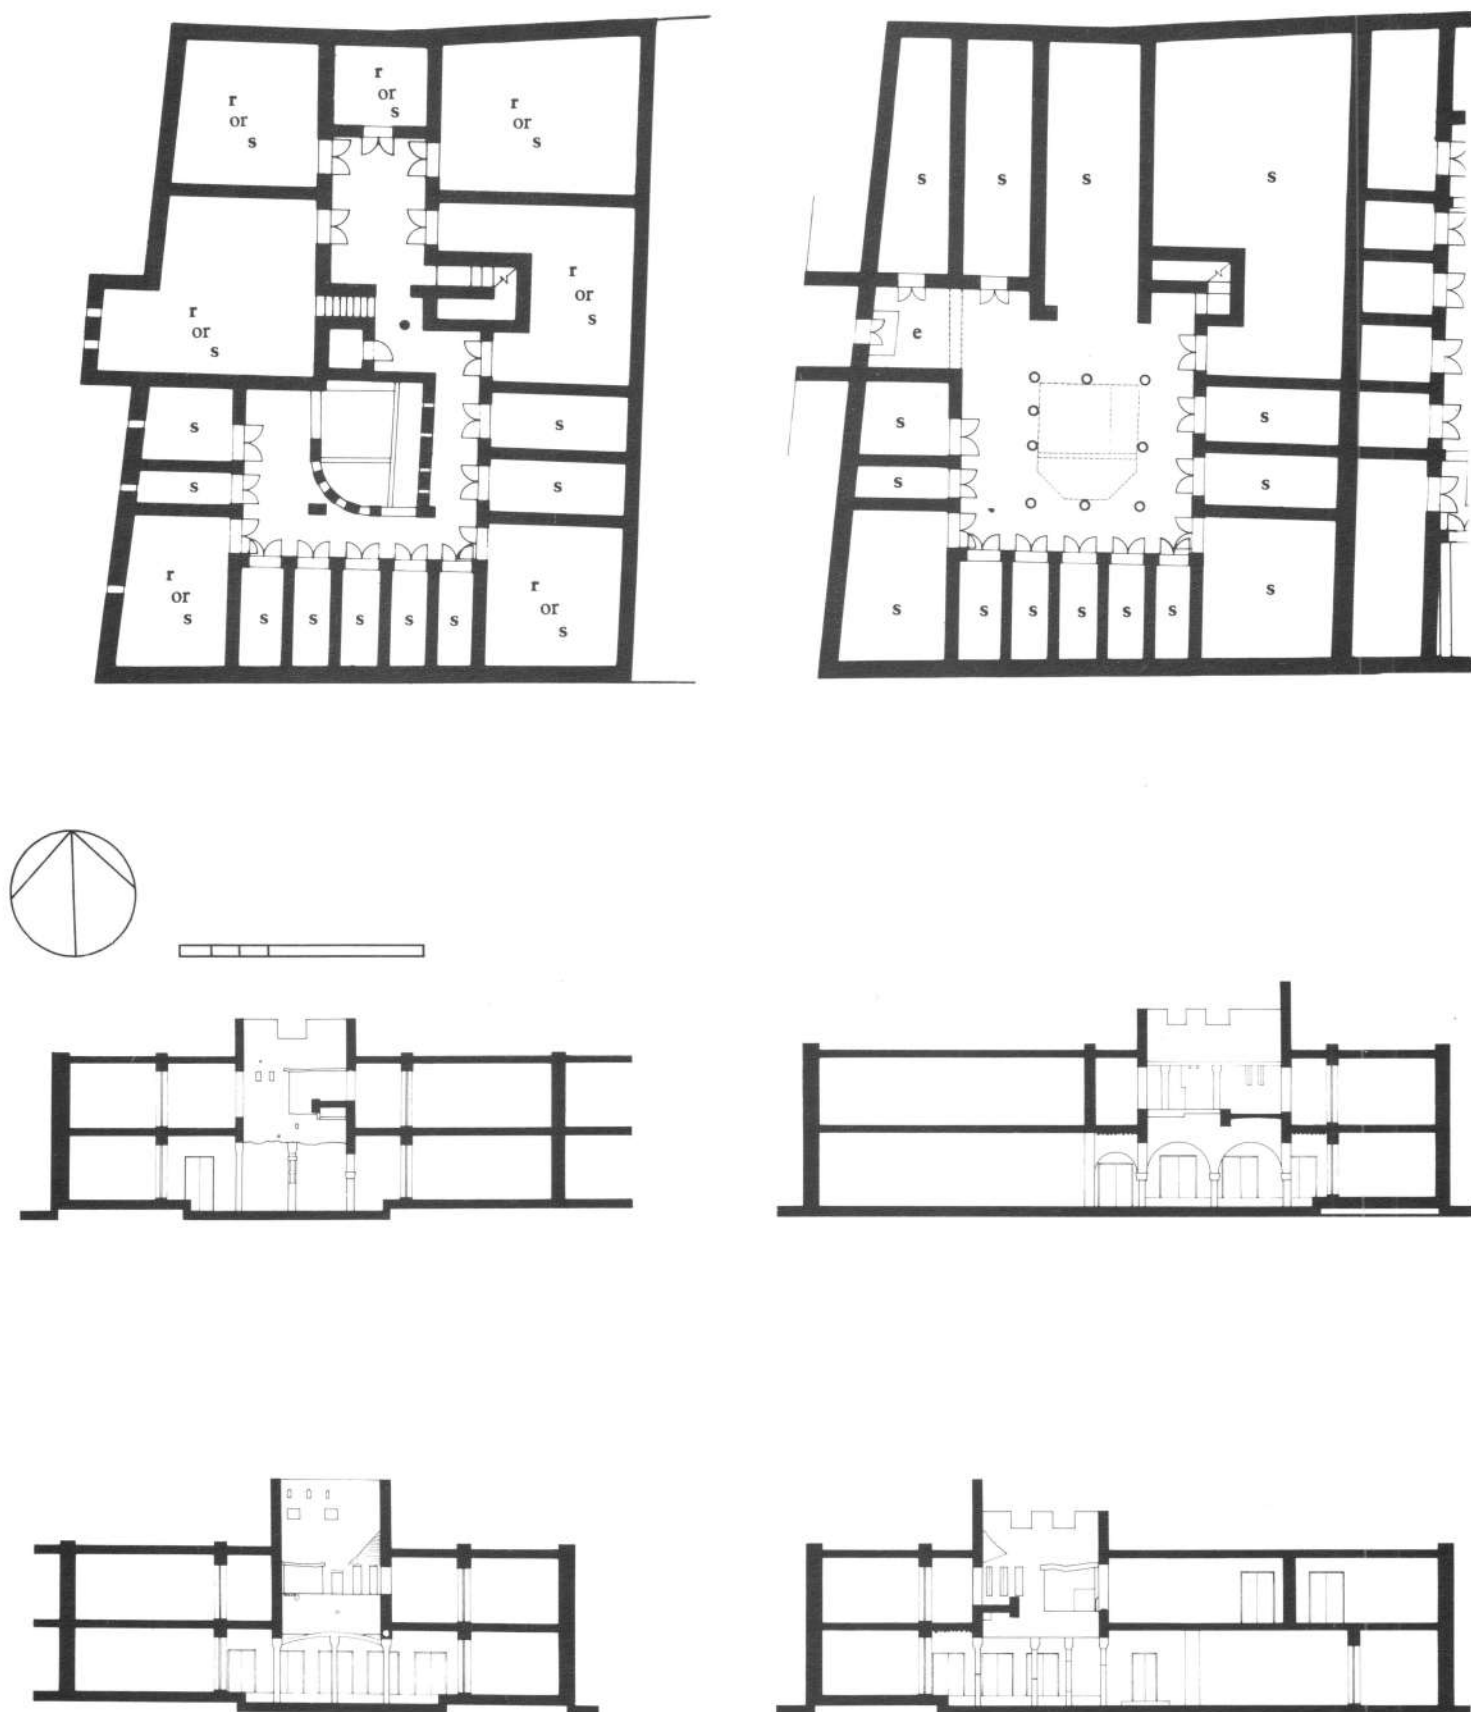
Samsarat al-Hawā'ij. Plans of ground, first and second floor levels and sections (adjoining building shown opposite).
